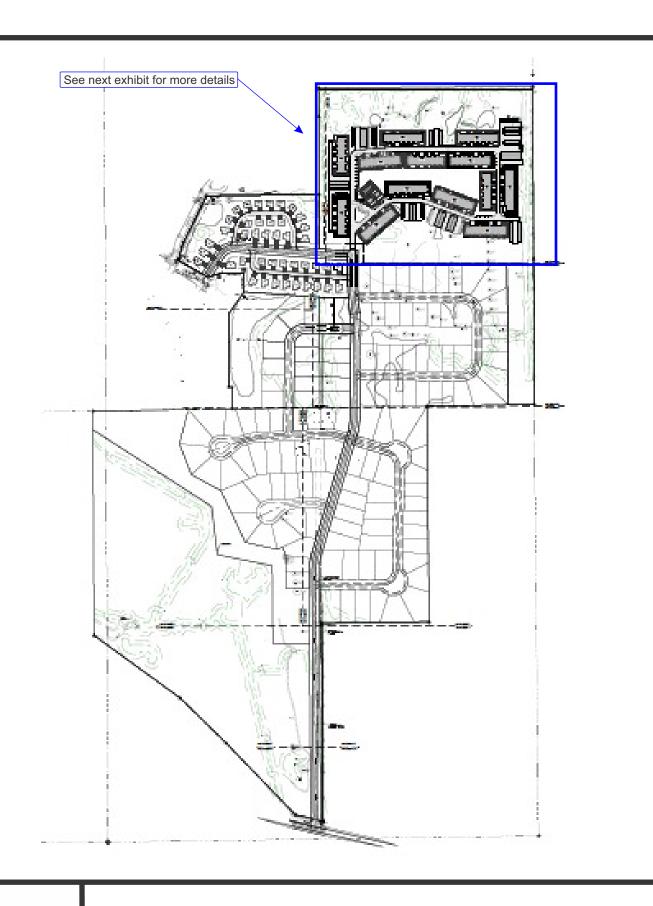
A CONCEPTUAL SITE PLAN OVERALL SITE PLAN
